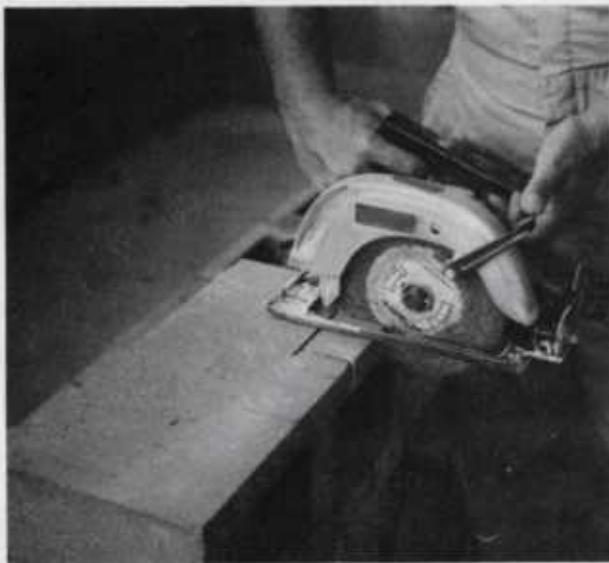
Saw openings in the concrete block to mount an electrical switch or outlet box.
